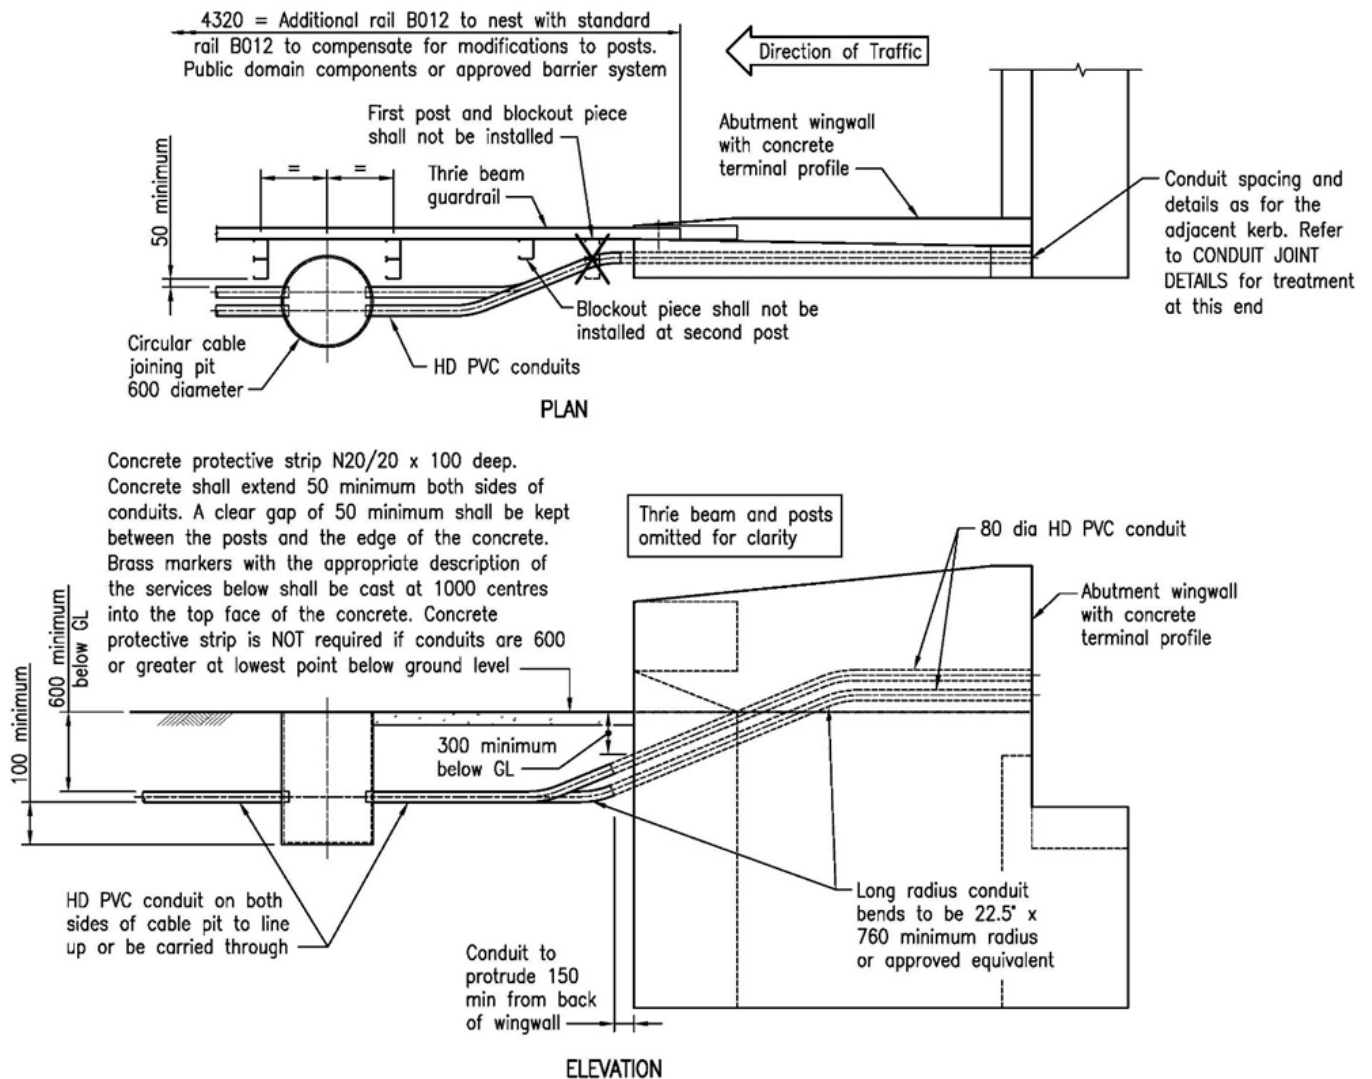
(e) – Conduit treatment and guardrail connection for concrete traffic barrier
